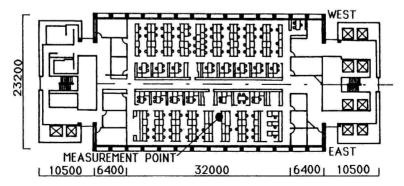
Plan (sixth floor). Windows are faced east and west; two elevator cores are placed on north and south sides.
